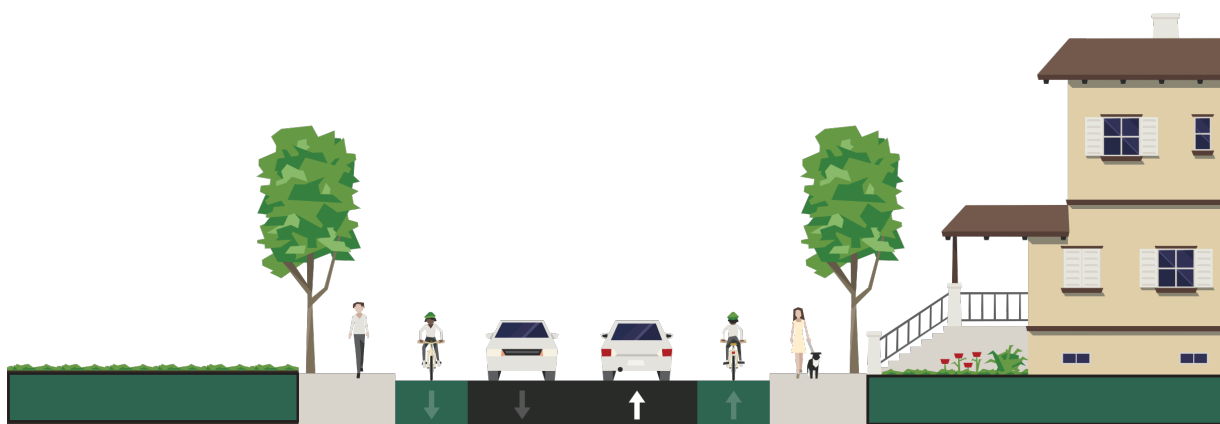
Example of “Complete Streets” elements (Streetmix.net)
